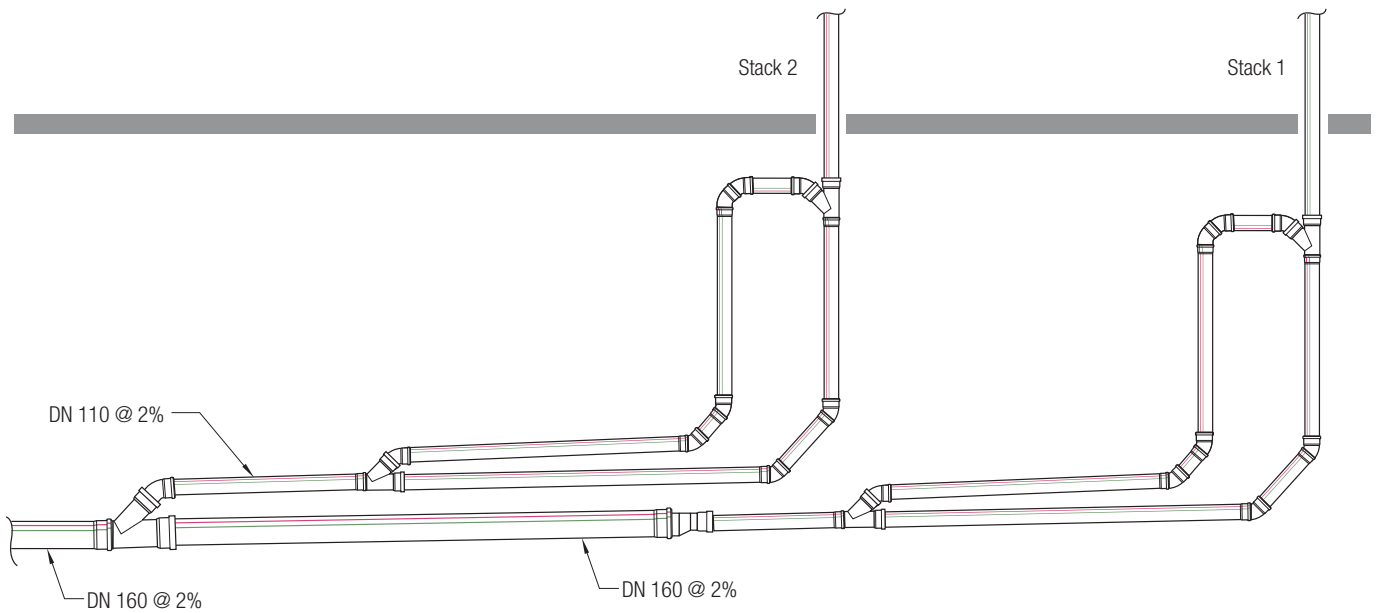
RAUPIANO Collector drainage plan – Example 3
